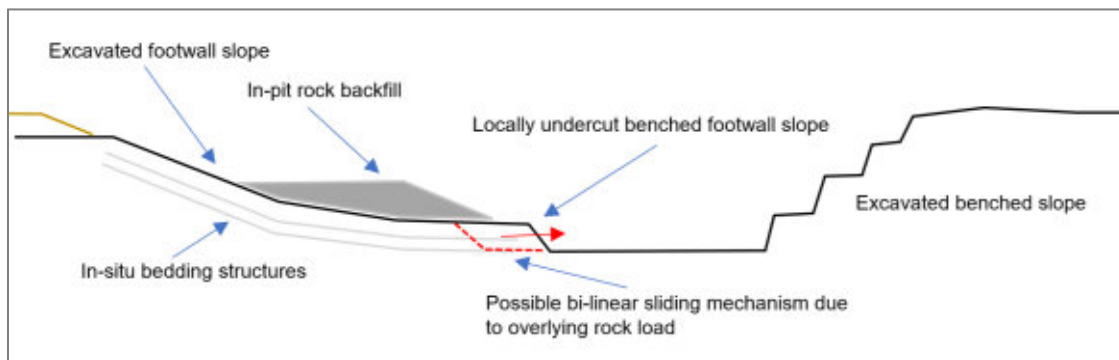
Conceptual example of the backfill rock loading on a locally undercut footwall slope
